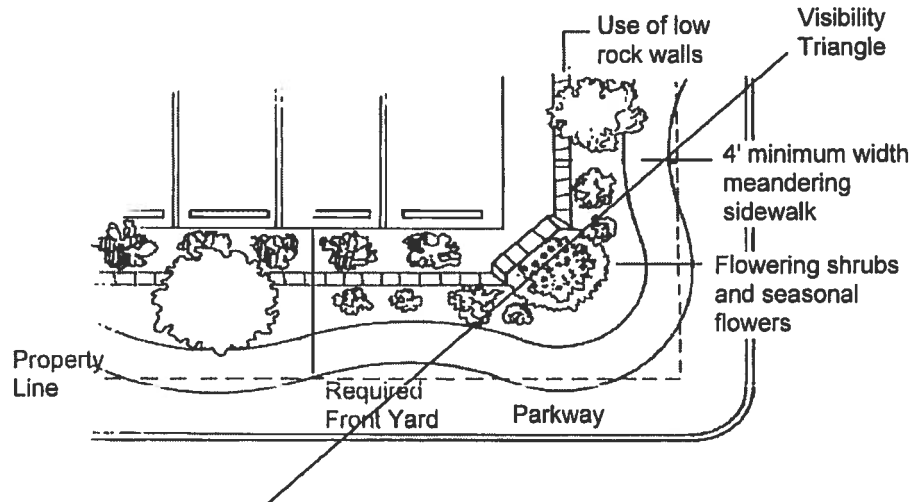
LANDSCAPING OF STREET FRONTAGES
